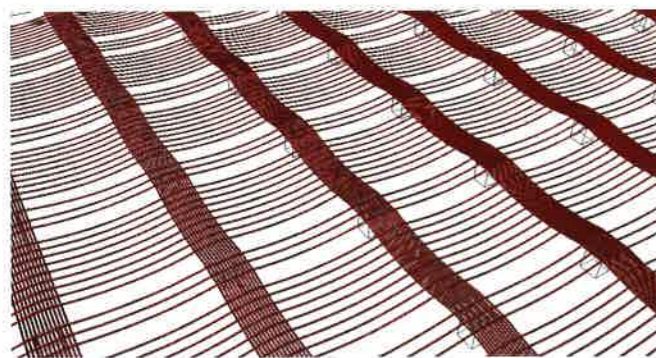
Partial Plan of Tendon Layout of a Water Tank Roof (figure shows column drops; columns not shown for clarity; Hefner, VSL grouted system; P518)
